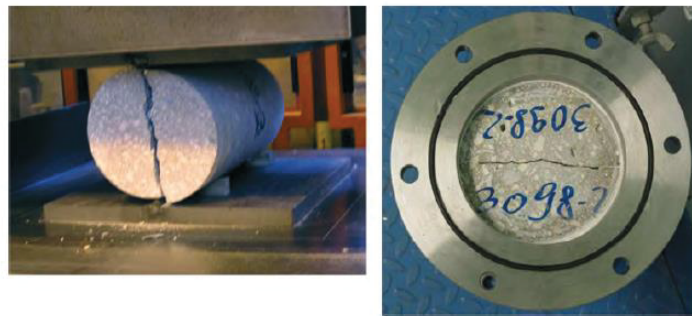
Instant of the splitting of one of the cylindrical samples (left), and view of the inlet of a crack sample positioned and sealed in the flanged steel holder (right).
